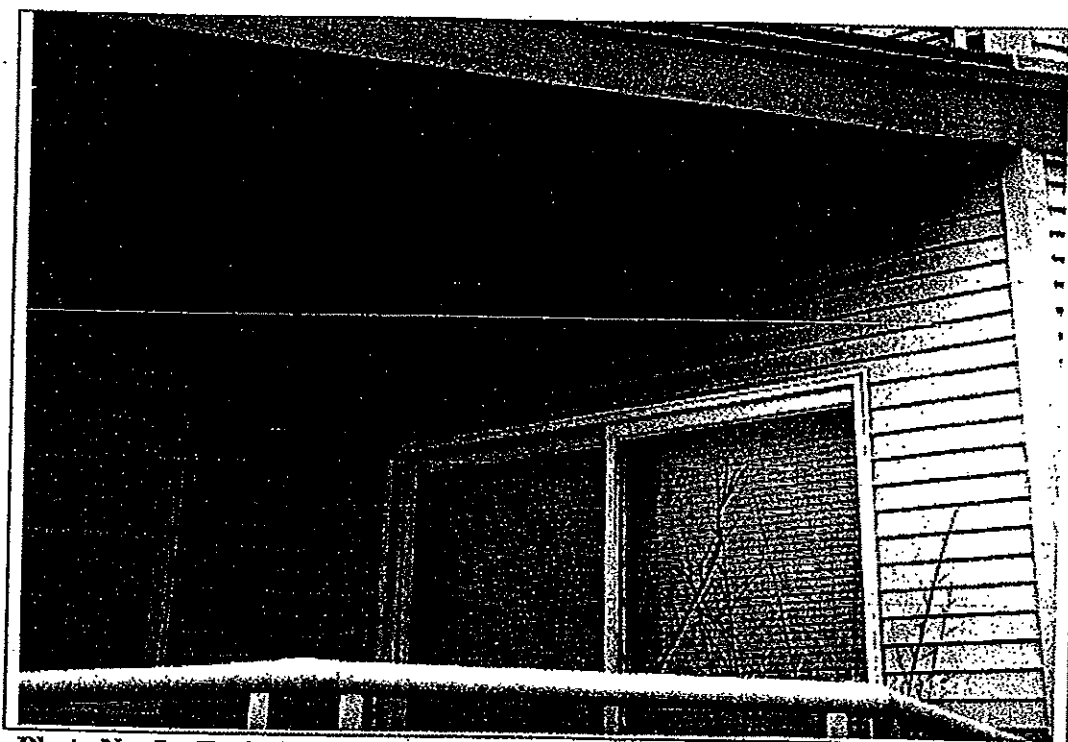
Typical streaks on the vinyl siding on wall area sheltered by a balcony above. The streaks may indicate water penetrating the balcony water proofing membrane.
